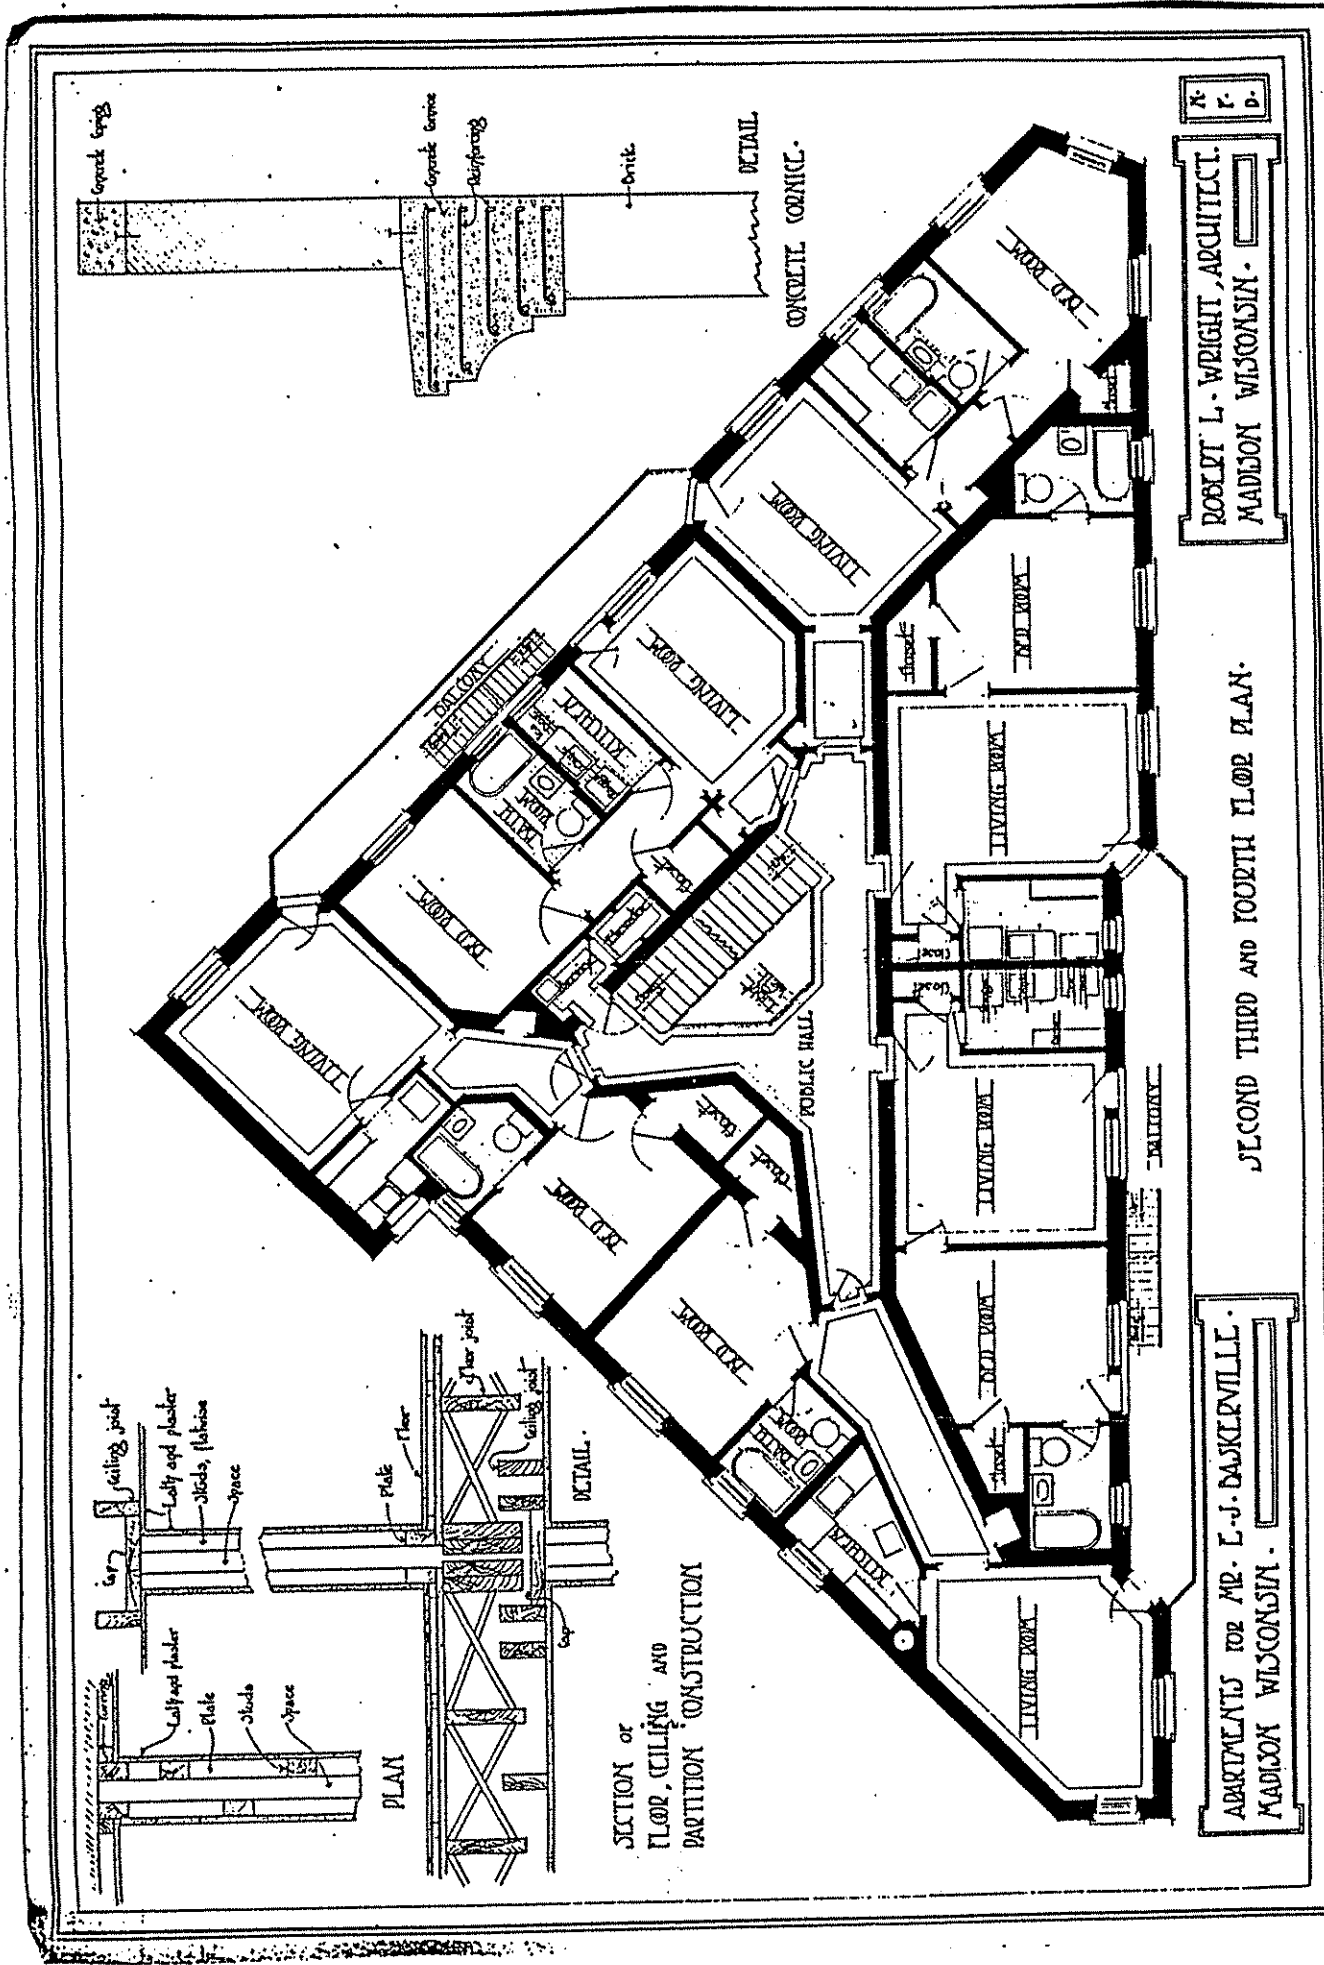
Baskerville Apartment Building, second, third, and fourth floor floorplan.
